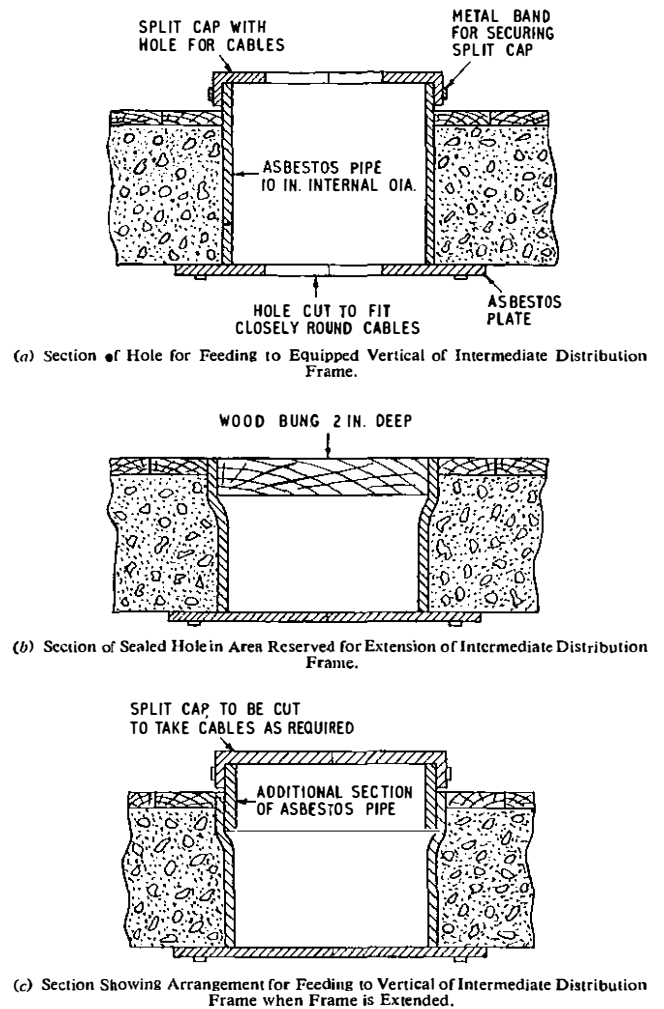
PROPOSED METHOD OF PROVIDING CABLE HOLES FOR INTER-FLOOR CABLING TO INTERMEDIATE DISTRIBUTION FRAME
